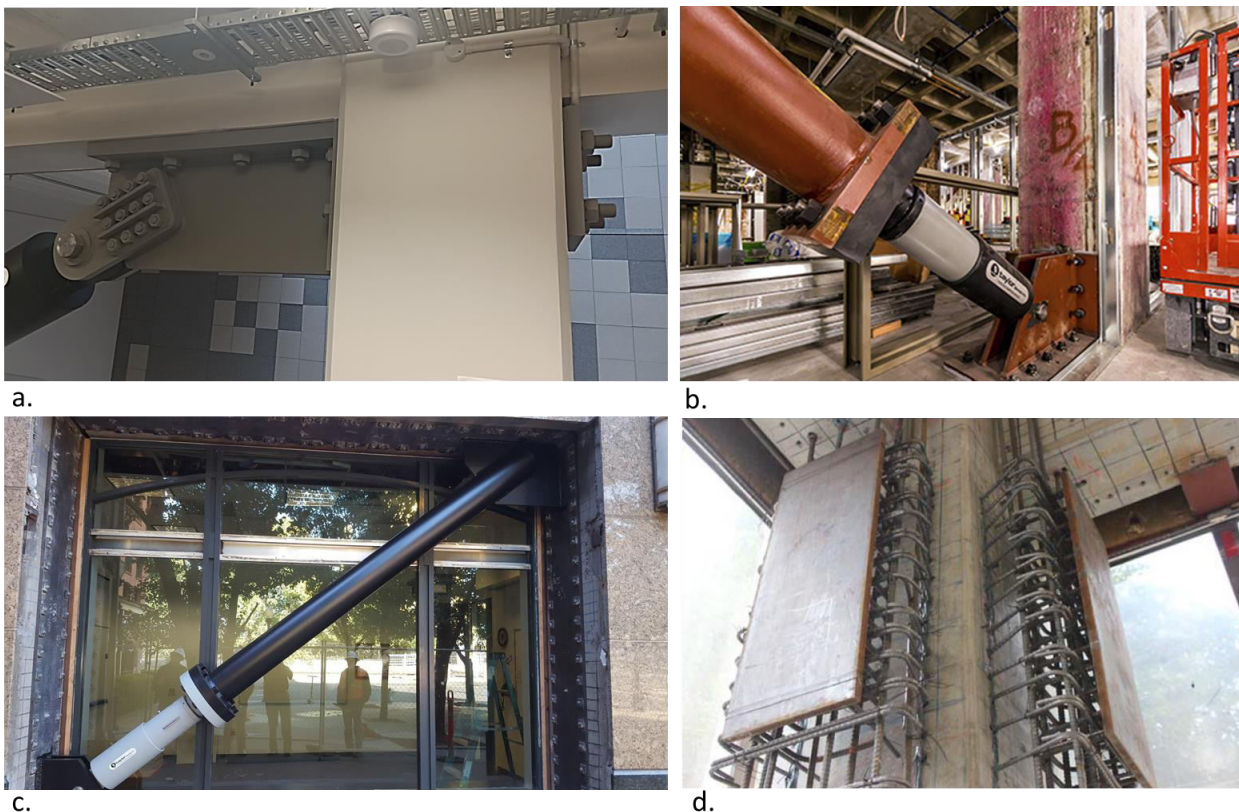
Examples of diverse approaches to adding dampers into pre-existing concrete moment frame structures.
